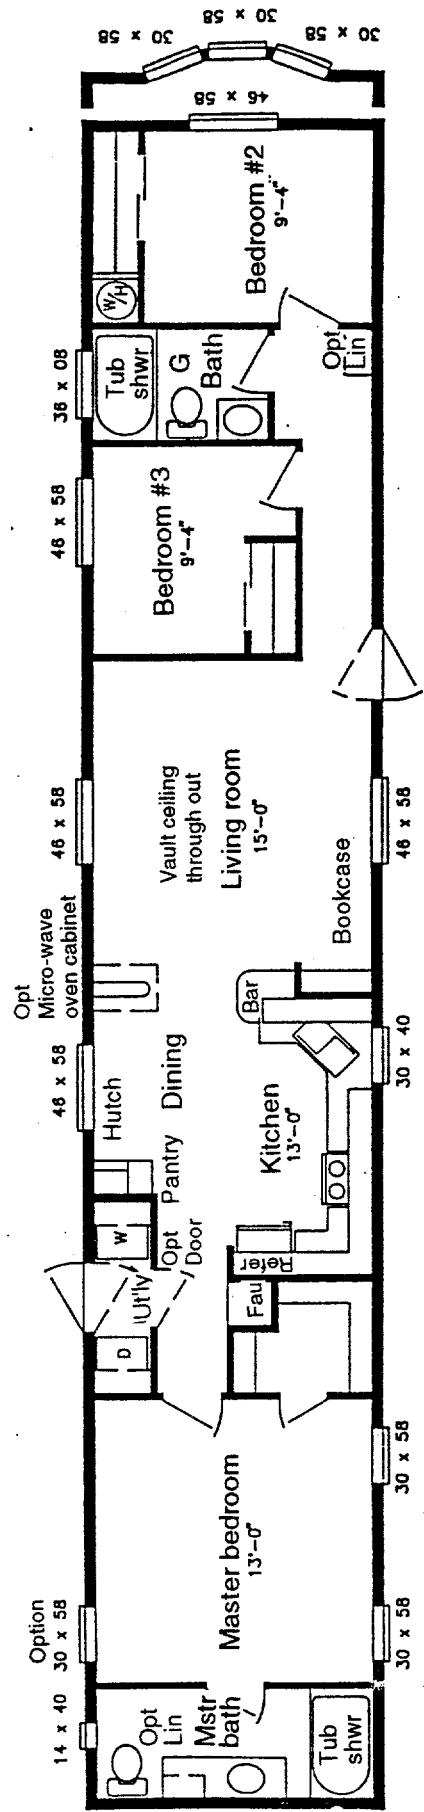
Original floor plan for single-wide trailer (Guerdon Model 47611).⁵
